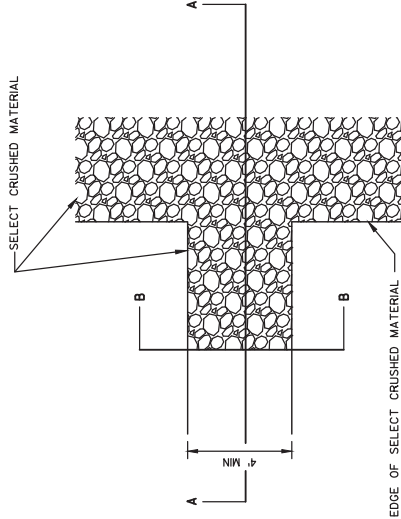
DETAIL FOR EXCAVATION BELOW SUBGRADE AT CUTS
